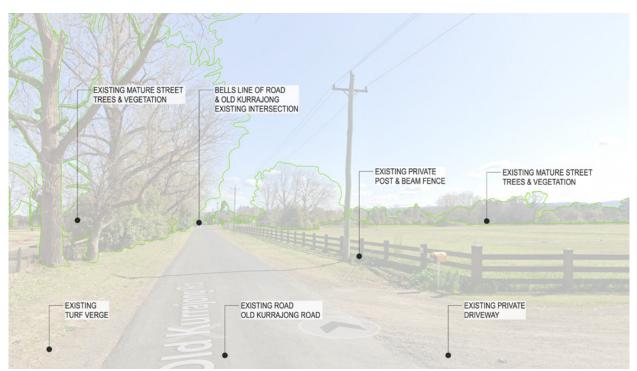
Viewpoint 4 - Existing view from Old Kurrajong Road looking south west towards the intersection with Kurrajong Road and the bypass
